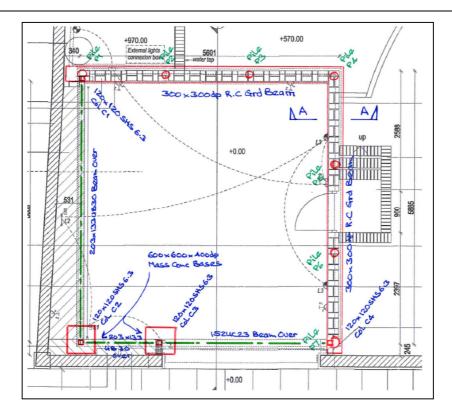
Extract from Drawing 13111A Rev A, sheet title 'Proposed Plan', showing construction of the rear and side walls of the garage on a reinforced concrete ground beam, supported by helical piles.
